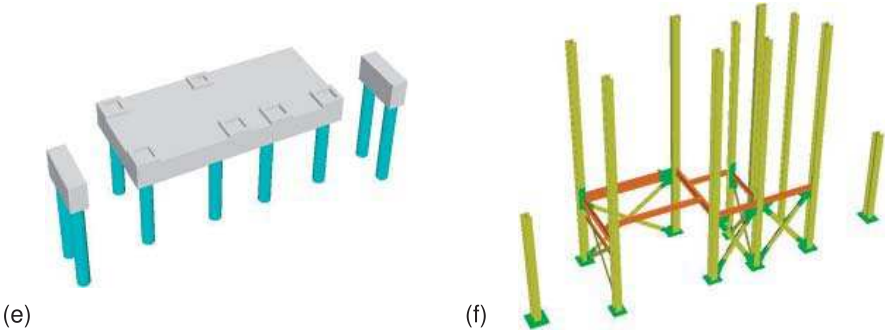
Structural – (e) foundations and (f) floor lift as defined by structural frame assembly
